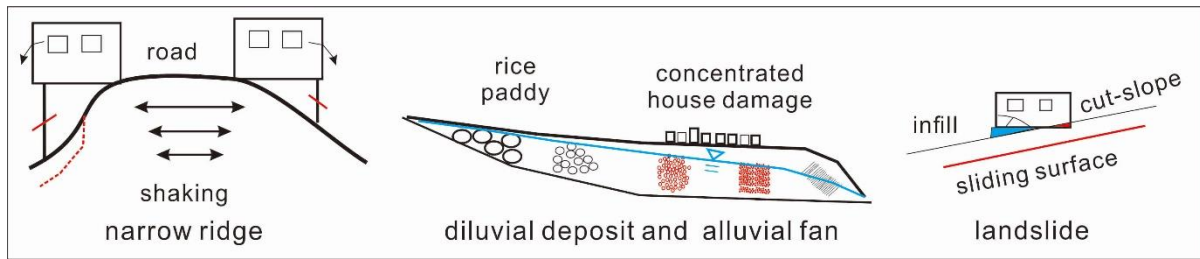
Three main patterns caused the house collapse and damages in 2015.4.25 Gorkha earthquake. (a) Building damage along narrow mountain ridge; (b) concentrated house damage on alluvial fan; and (c) house damage on existing landslide
